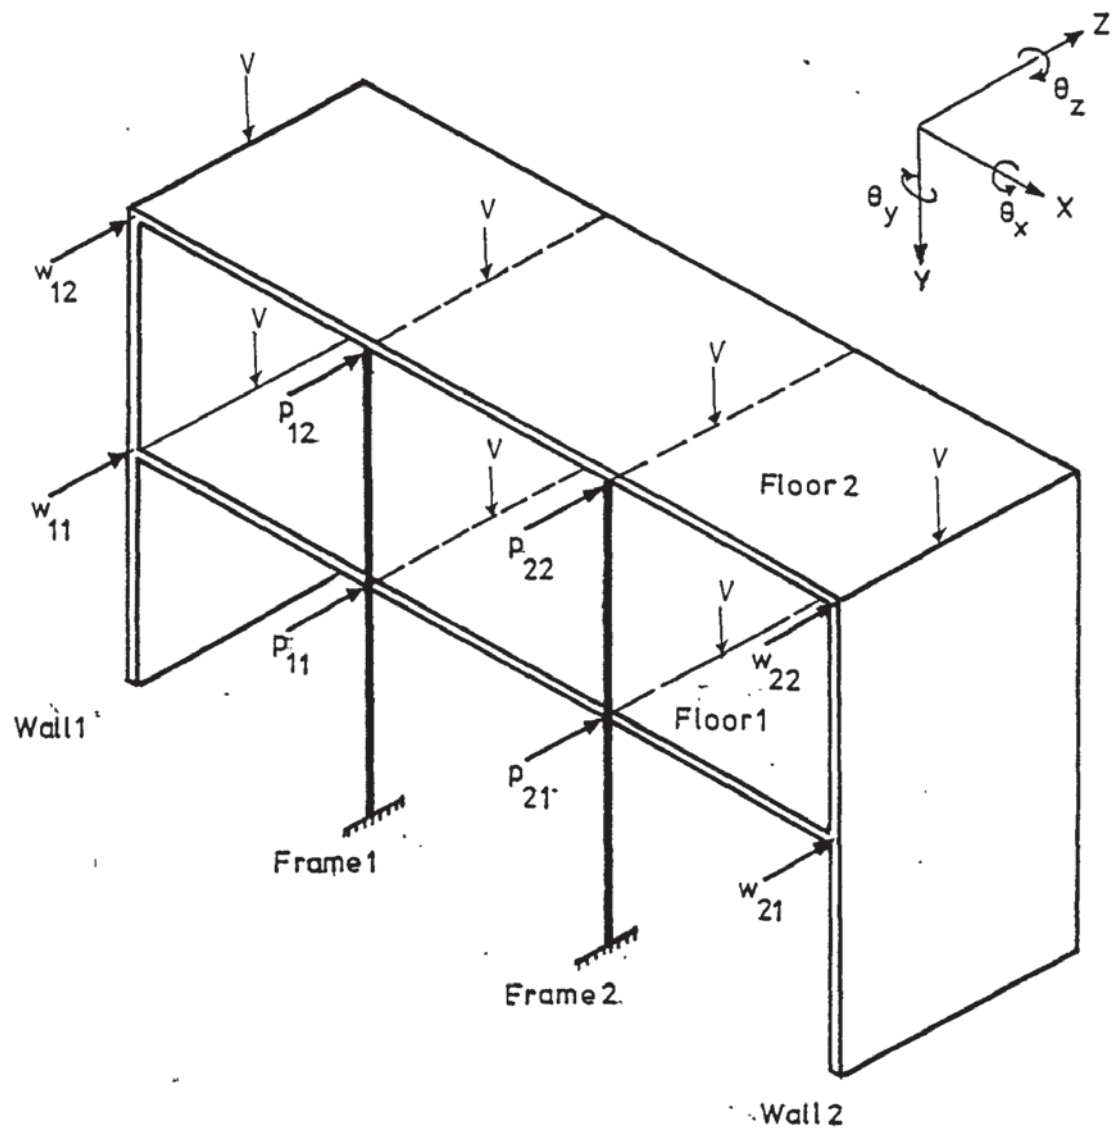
A COMPLETE STRUCTURE, LOADING AND SIGN CONVENTION
